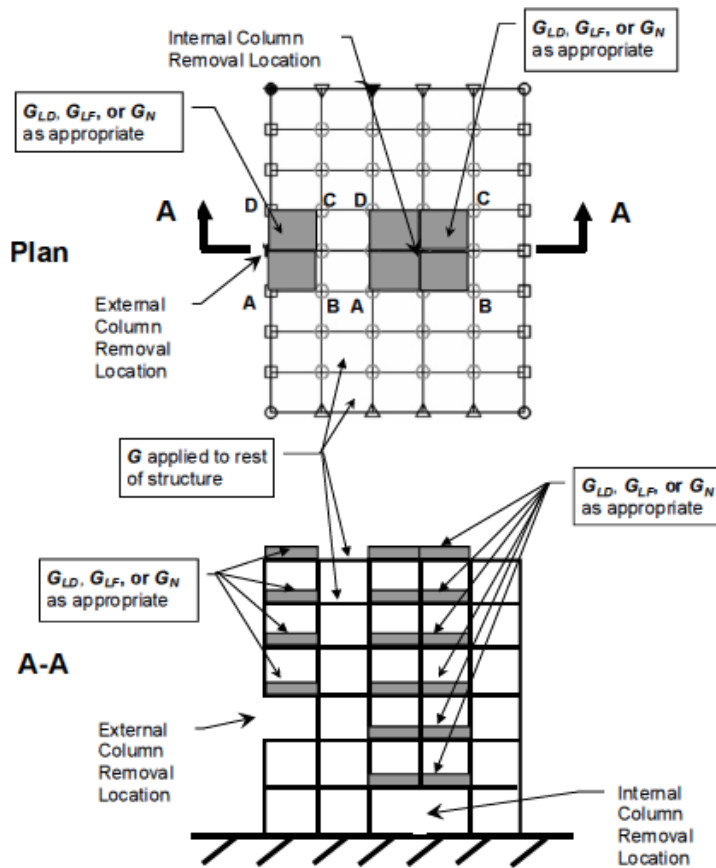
Loads and Load Locations for External and Internal Column [31]
